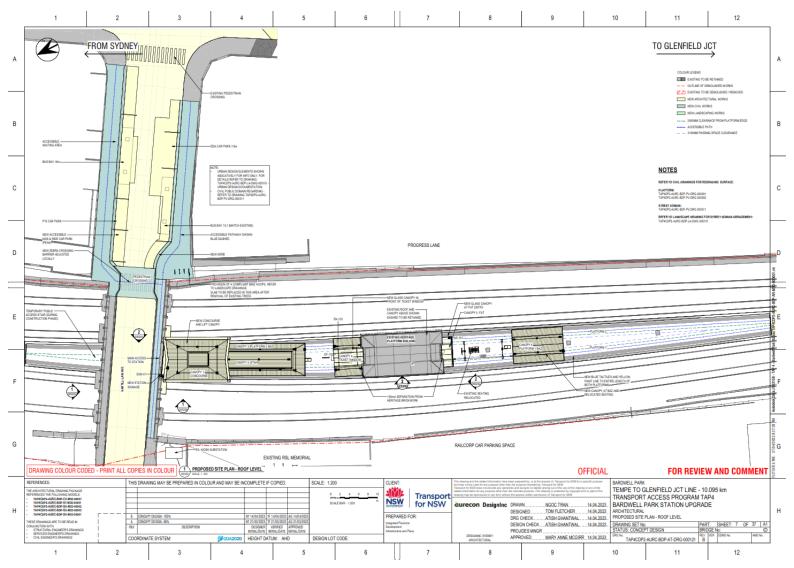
Proposed site plan for Bardwell Park Station (Source: Aurecon, 2024)
